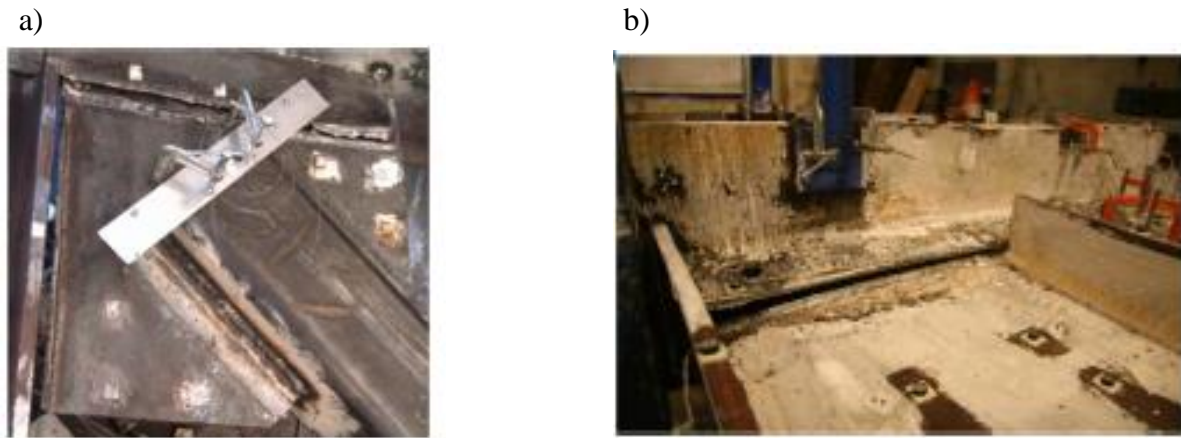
a) Connection fracture in NCBF 2; and b) Weld fracture in NCBF 3 (Johnson et al. 2014).
